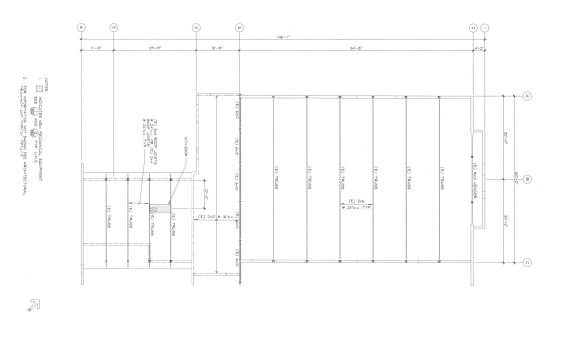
BUILDING 2: 2017 HVAC Upgrade Roof Framing Plan
